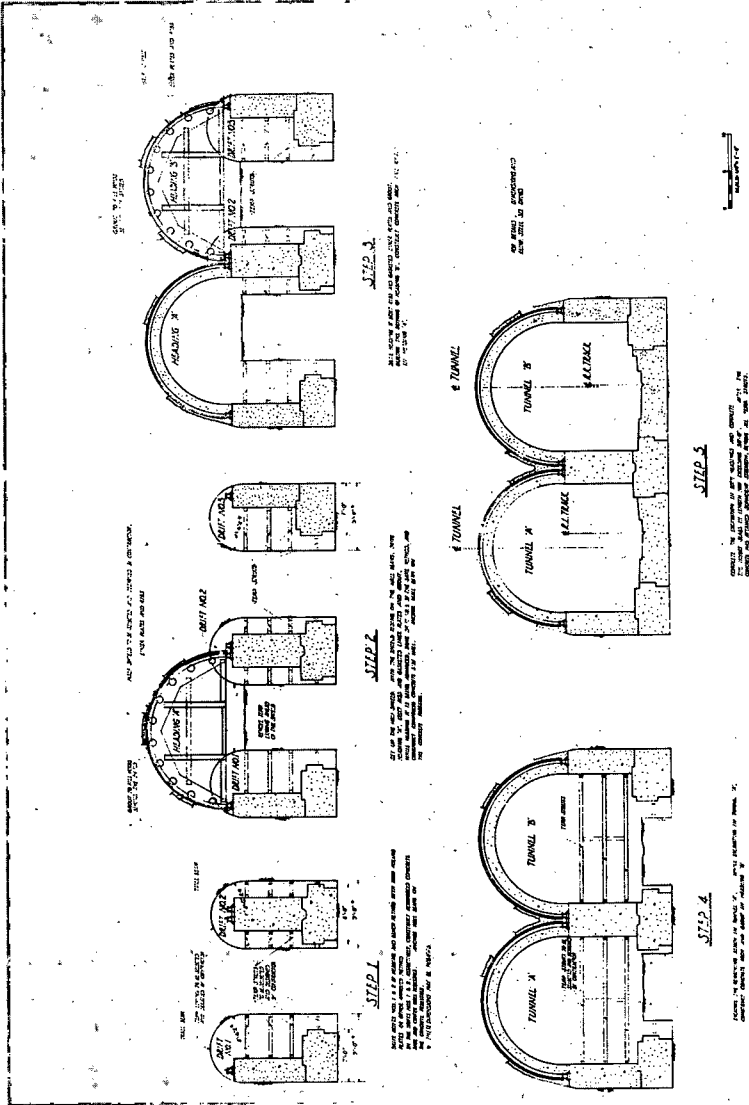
Cross-sectional view shows the step-by-step procedure in the construction of the tunnel structure. The permanent vertical walls of the tunnel will be constructed within three parallel drifts which will form the guideways over which the roof shield will be advanced.
